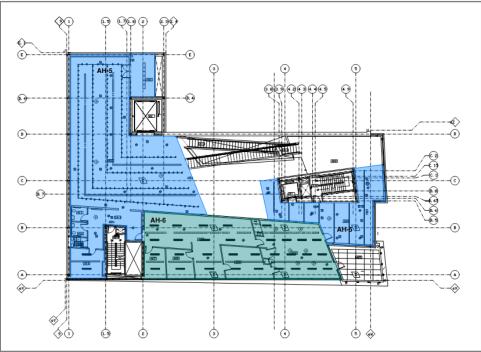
Fourth Floor AHU-5 and AHU-6 Zone
